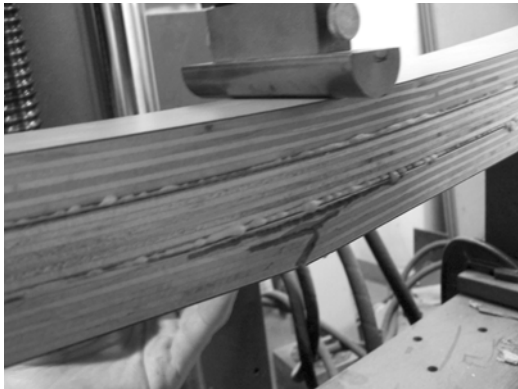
Failure type (simple tension) of static bending for 3-laminated plywood lumber specimen.
